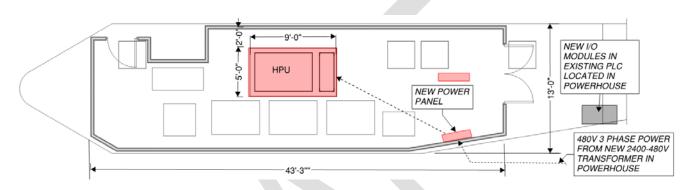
TP-3 (Lake McQueeney) Building Plan
